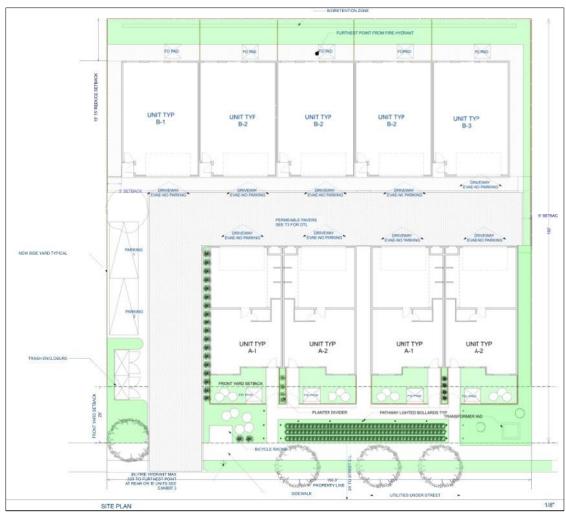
The proposed project, site plan (MFA Construction and Engineering, December 2022).
